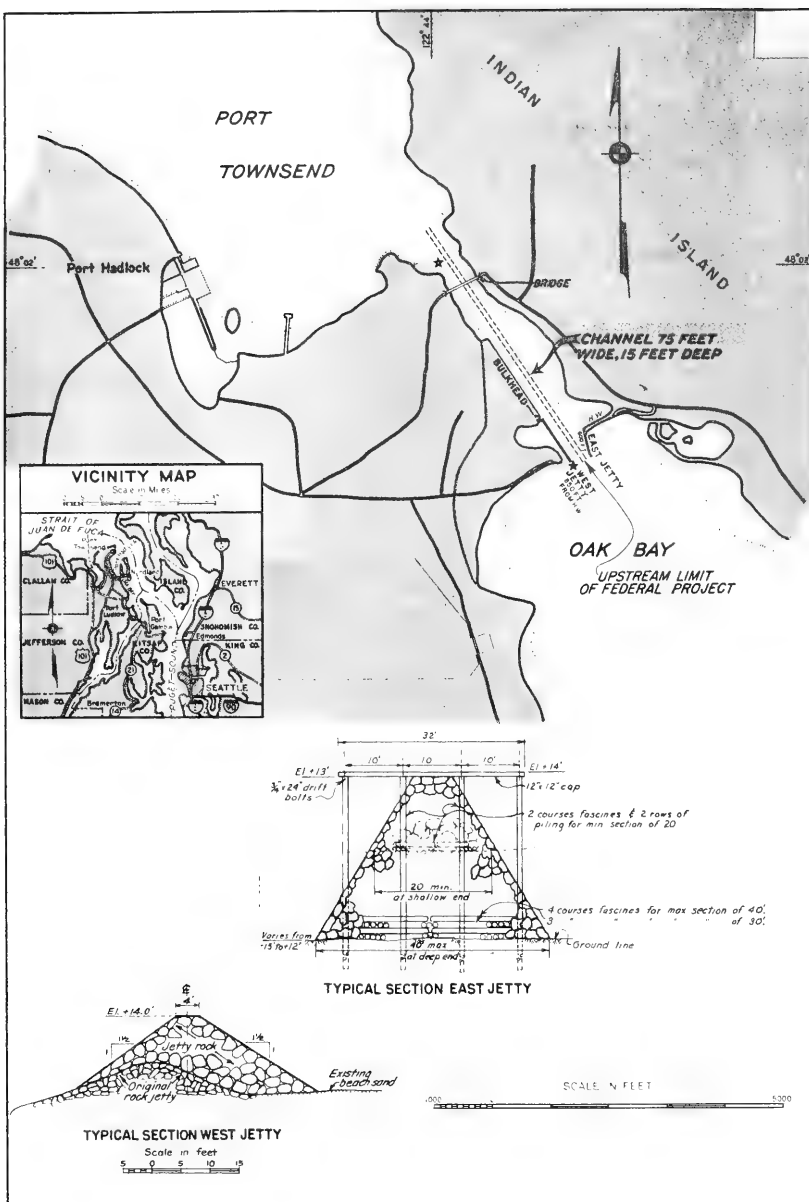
Site layout of waterway connecting Port Townsend and Oak Bay, Washington (revised 1979)
